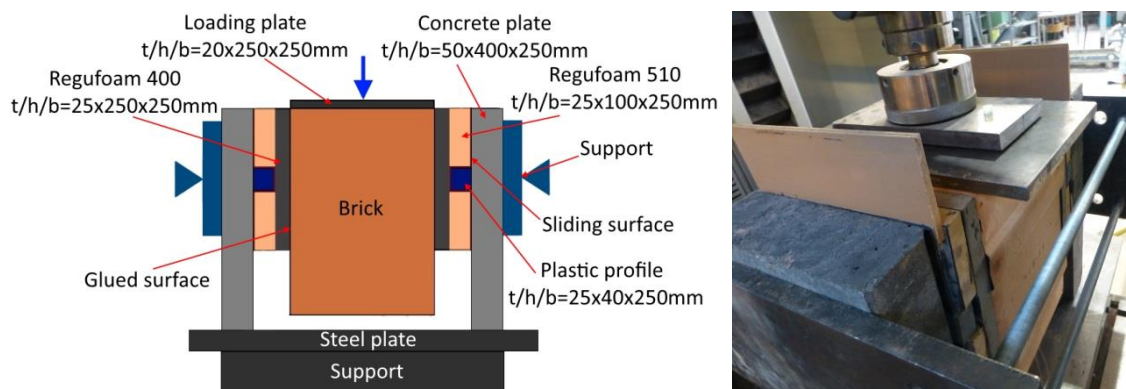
Test setup for the connection of the U-shaped elastomer to the top beam
